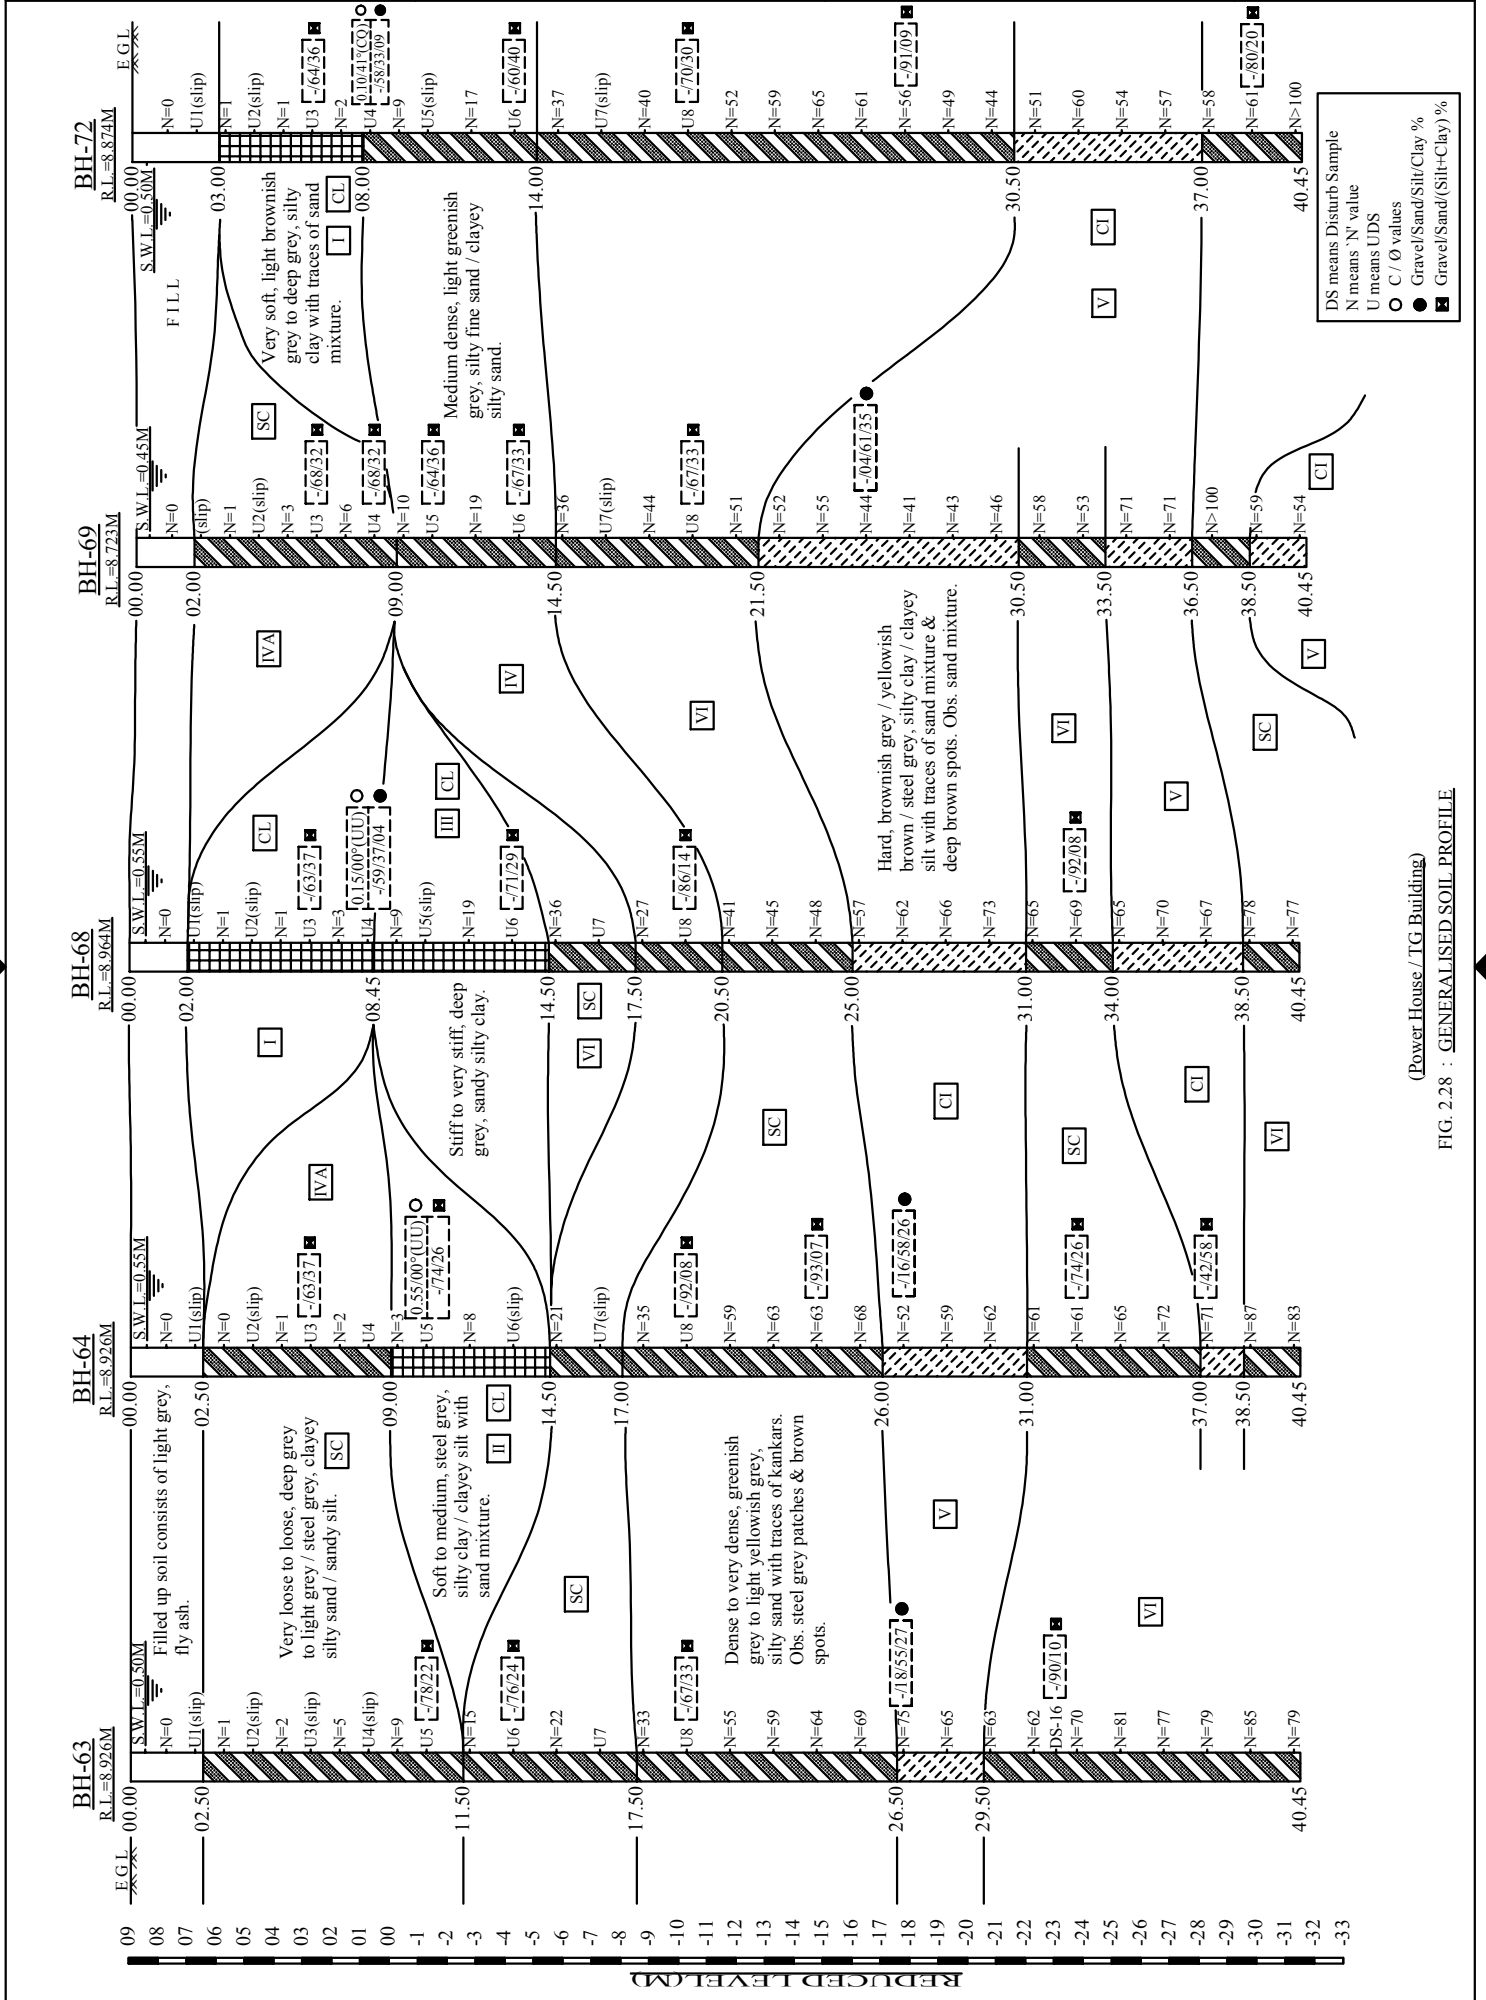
GENERALISED SOIL PROFILE (Power House / TG Building)
